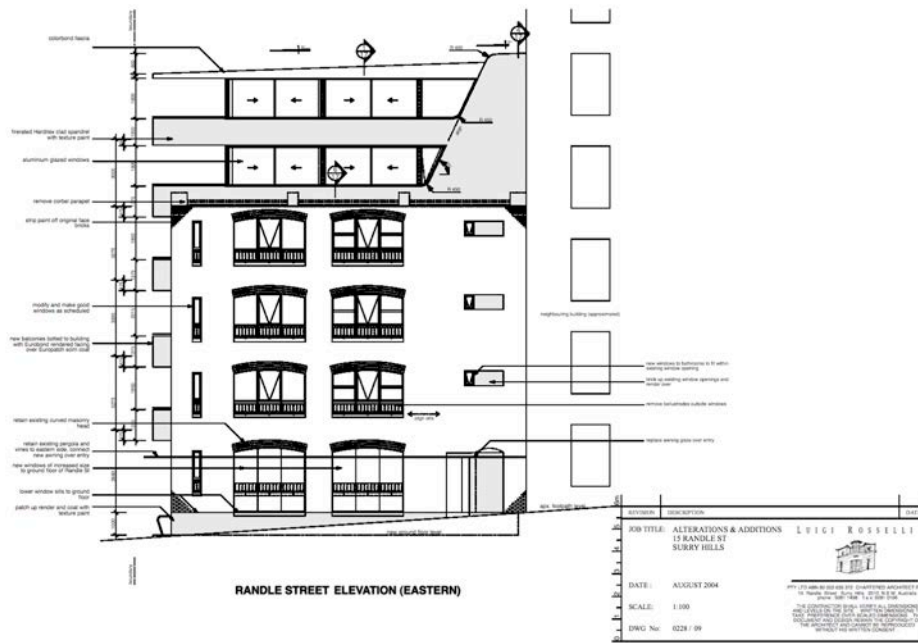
About 30 years after the fire in 1973, in 2005, the office building was converted to loft apartments. The work included addition of two floors and a wall of Juliet balconies. The architect was Luigi Rosselli
